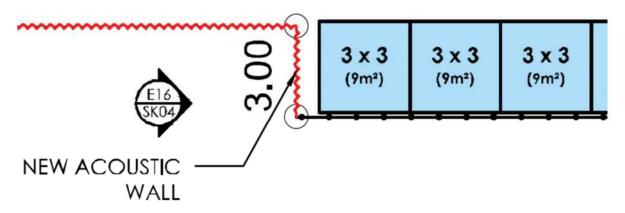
Layout Plan showing acoustic wall extent (red line) Source: Jacob
